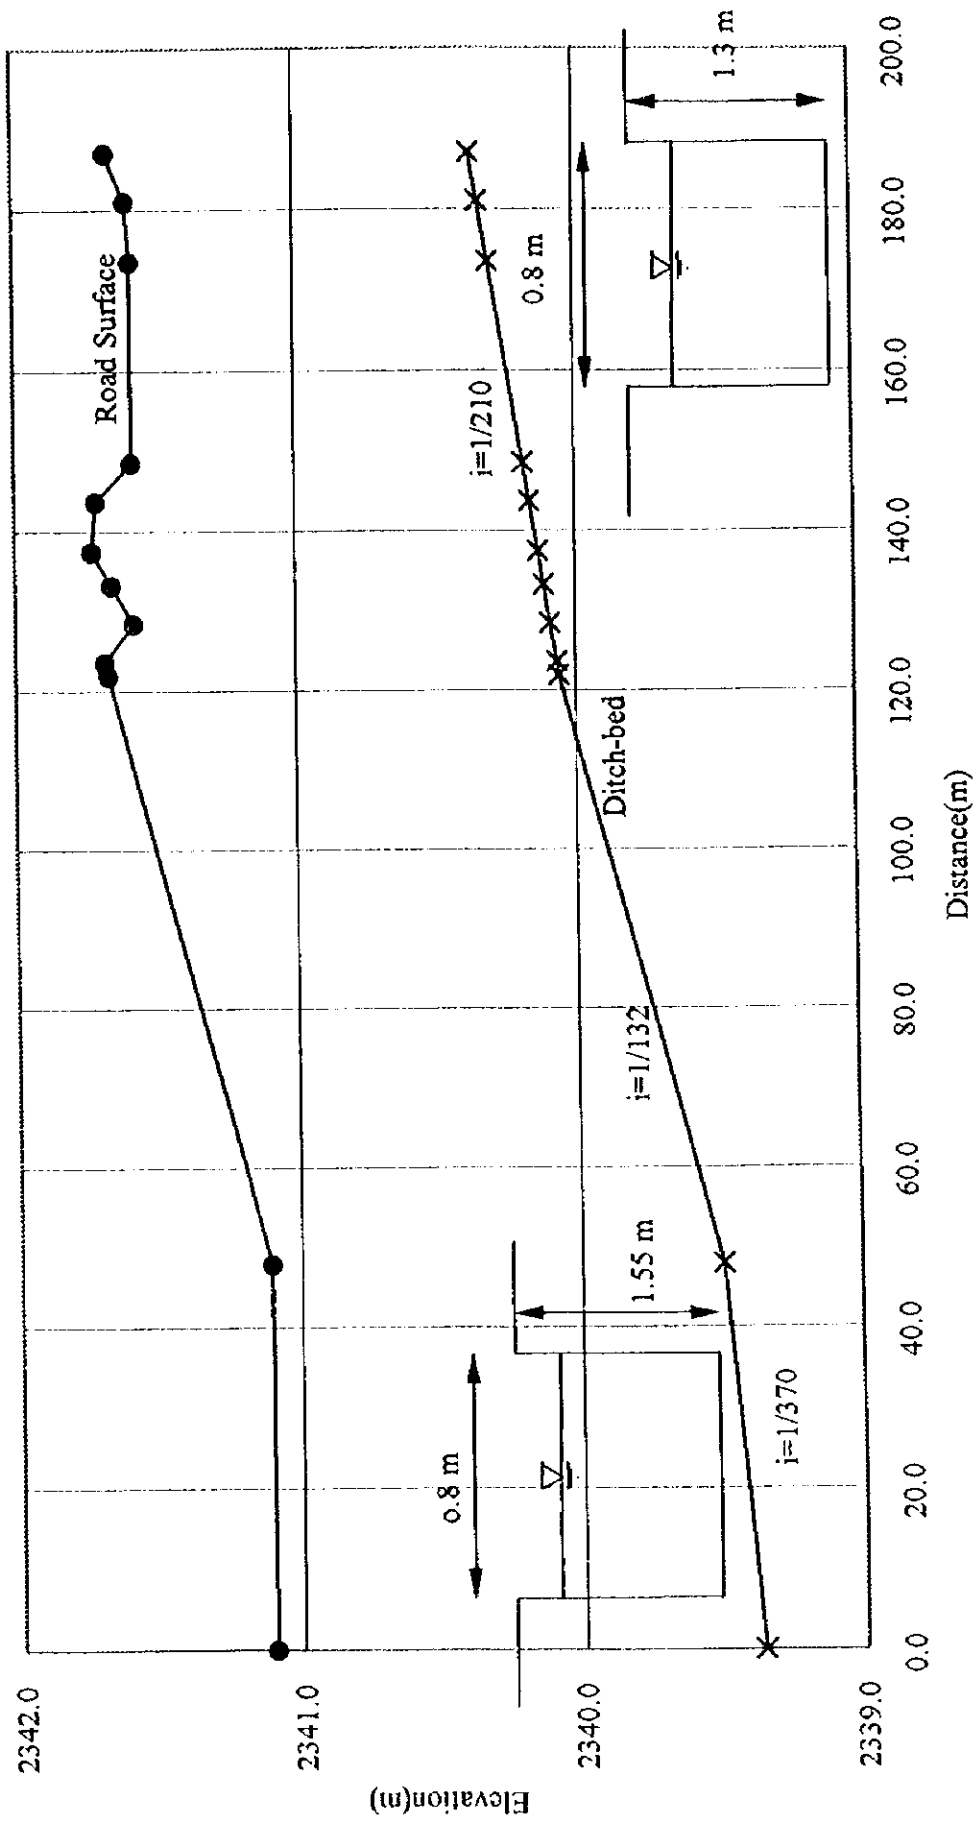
Longitudinal and Cross-sectional Profiles of Drainage Ditch for WS2 Basin
